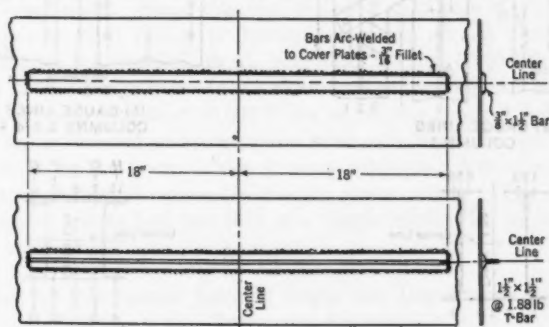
BARS WELDED TO COVER-PLATES, COLUMN NO. 4.
